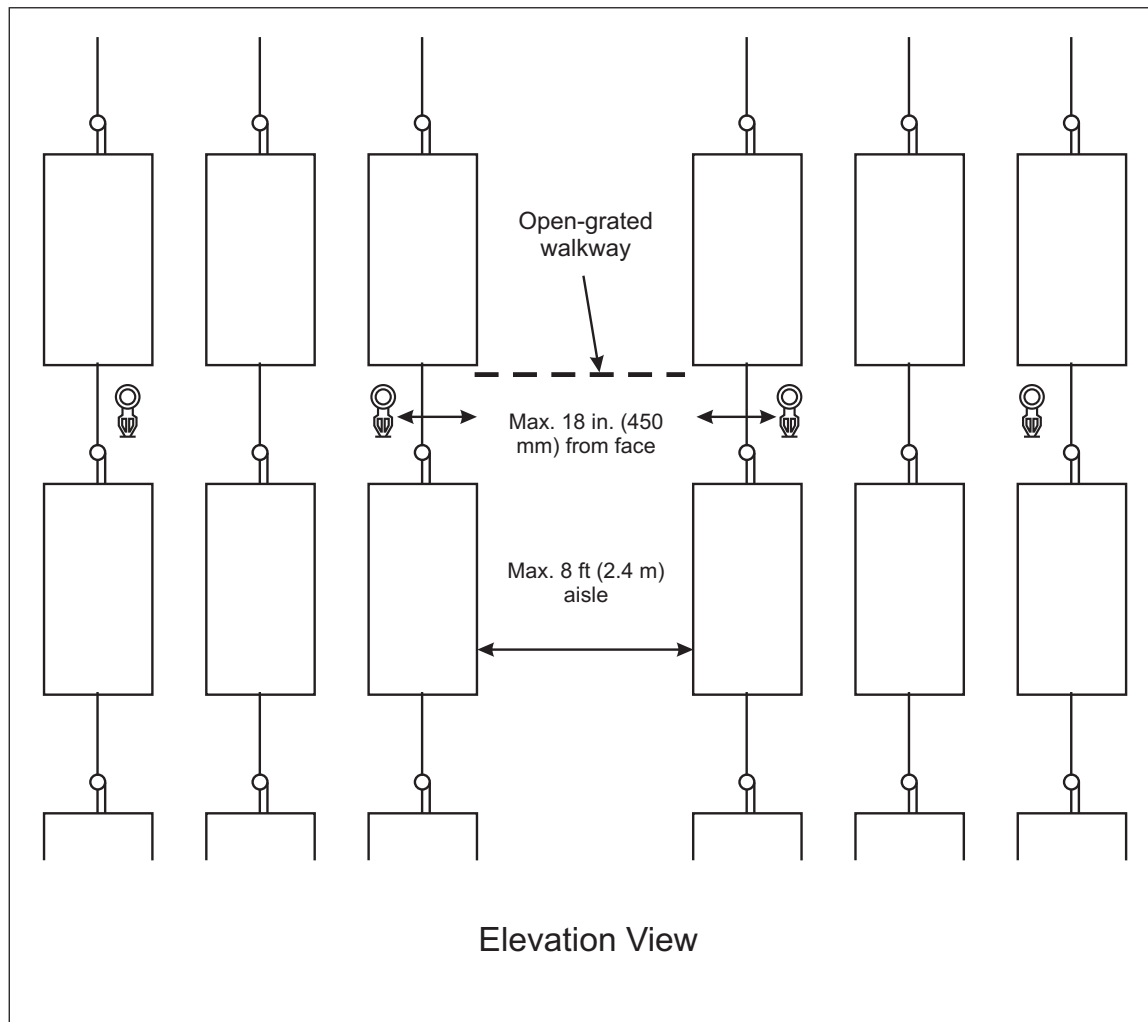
Exception when sprinklers not necessary under open-rated walkway
